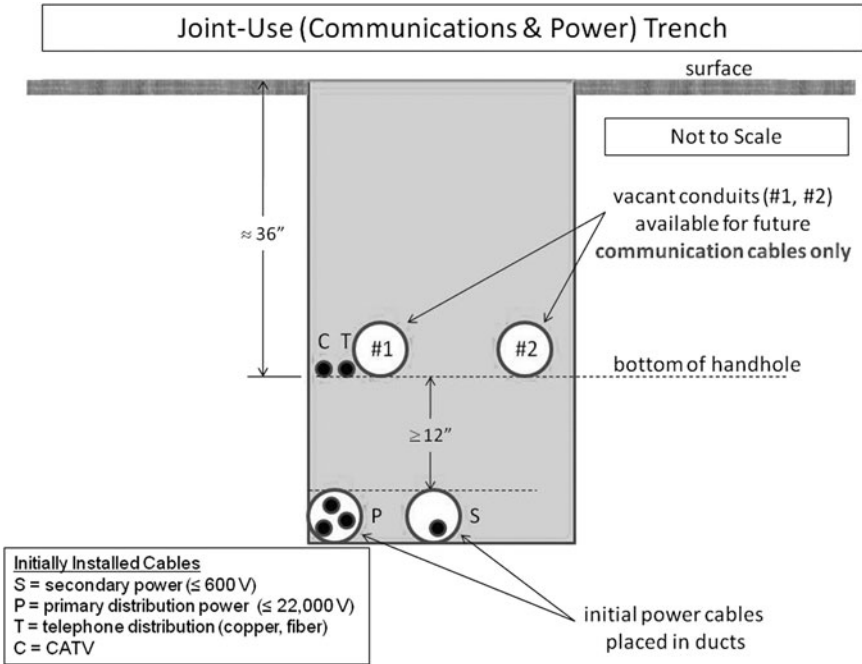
Joint-Use Trench, Including the Example BCN for Communication Only with Initial Power Cables in Ducts (Trench Backfill Details Not Shown; see Section 3.2.2.1).
